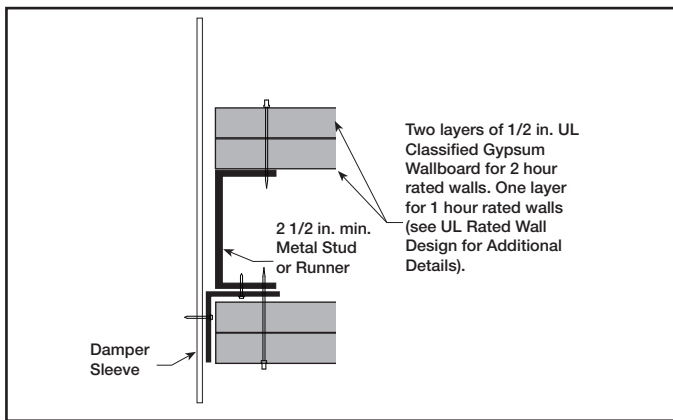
Single Side Angle With Steel Stud Wall - Angle Under Wallboard
